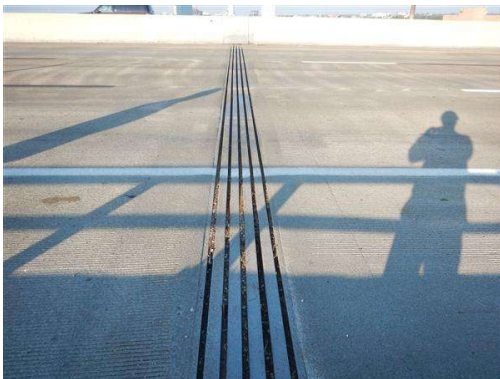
Expansion joint at Pier 30NB filled with debris and growing vegetation looking West
